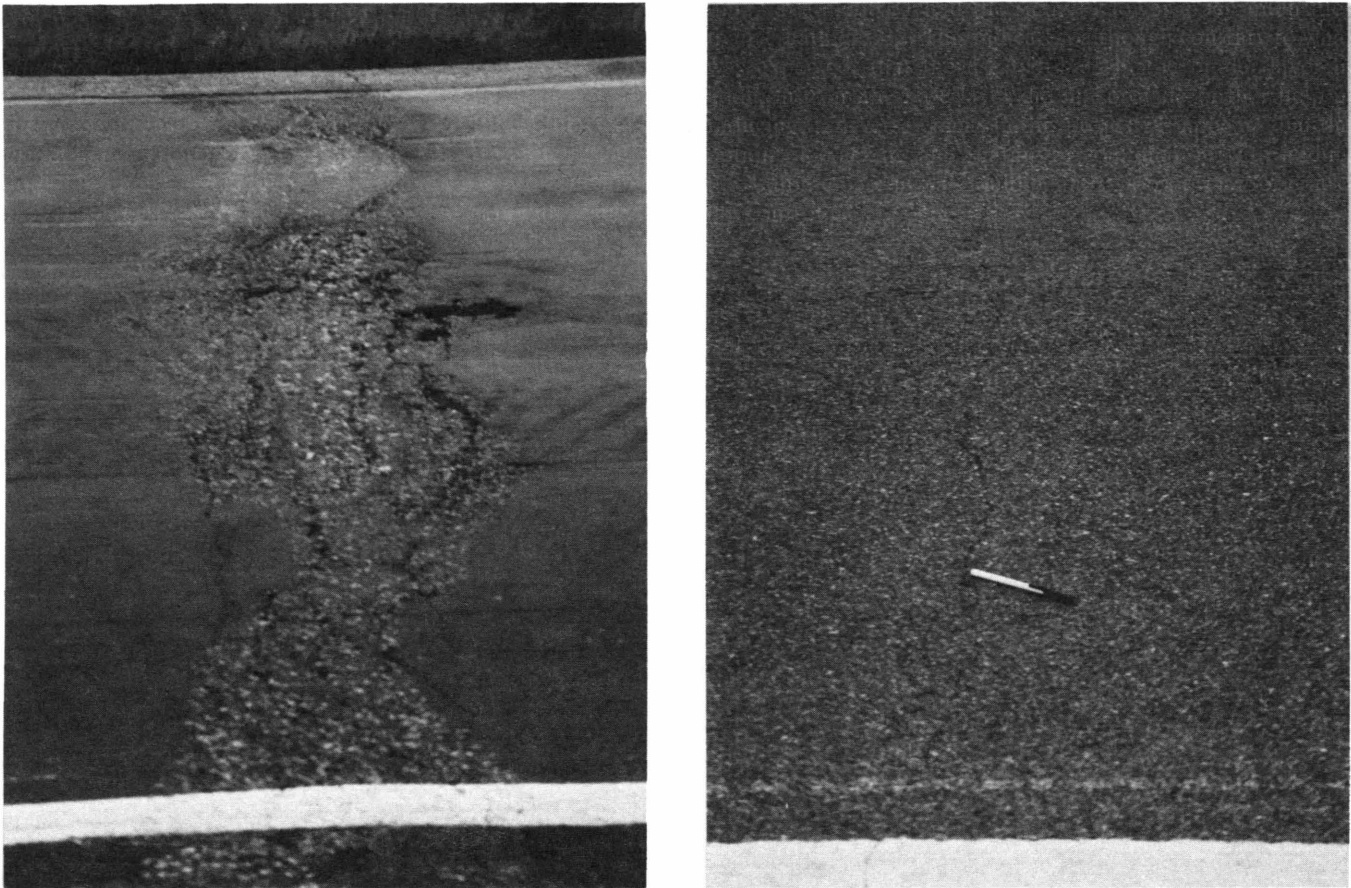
Examples of transverse cracks: *left*, deteriorated pavement around a reflective crack on control section; *right*, typical transverse crack on cracked and seated section.
